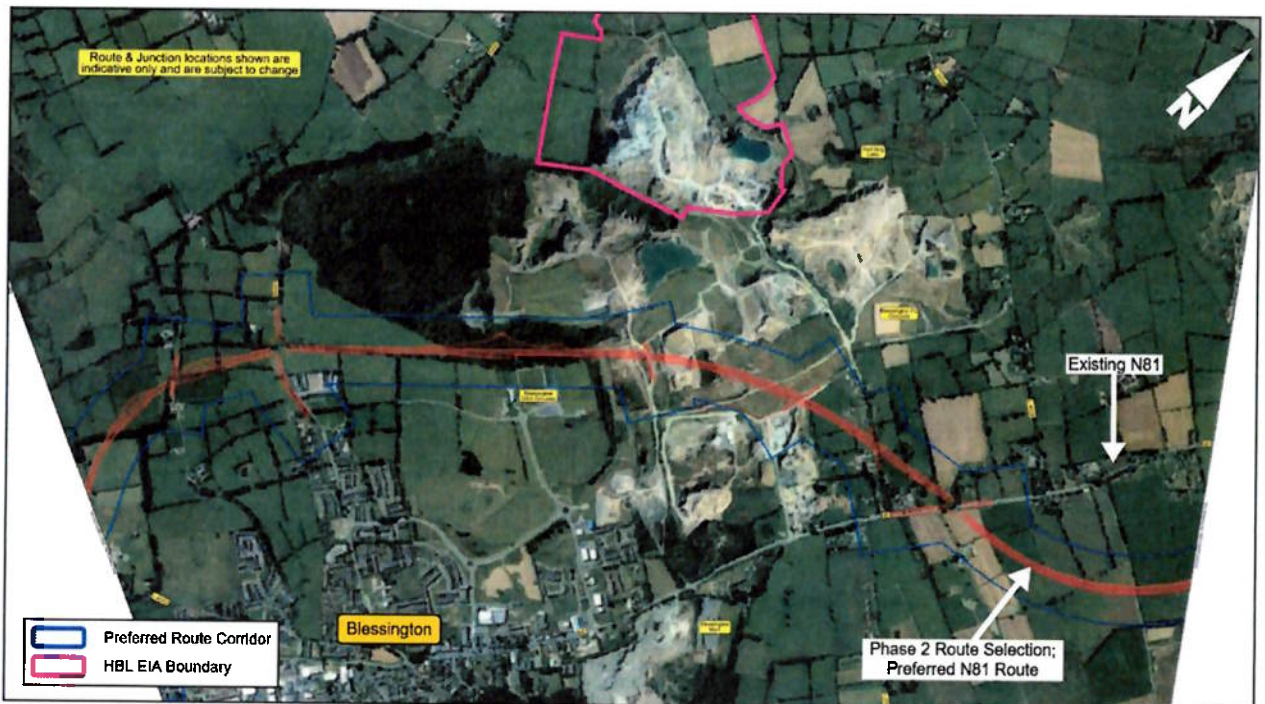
N81 Hollywood Cross to Tallaght Road Improvement Scheme, Preferred Route Corridor, Kildare NRO, May 2016.
